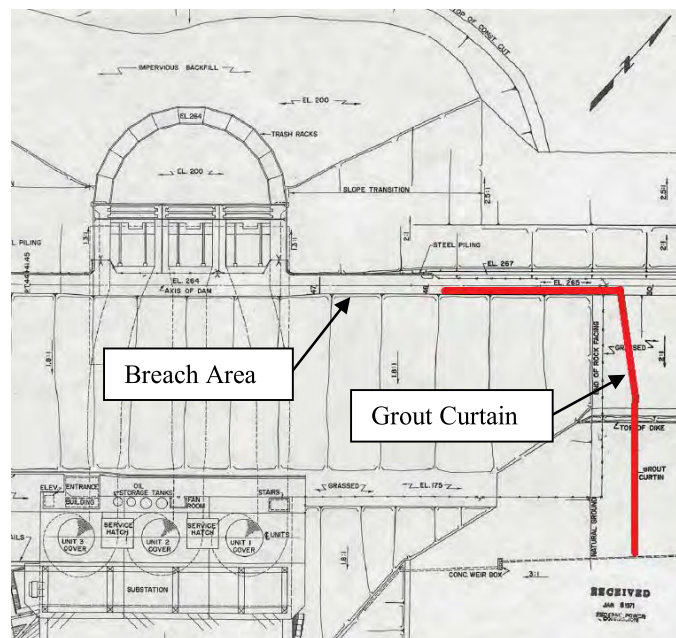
Left side of intake structure and grout curtain (red line) in area of breach (modified from FERC 1978).
